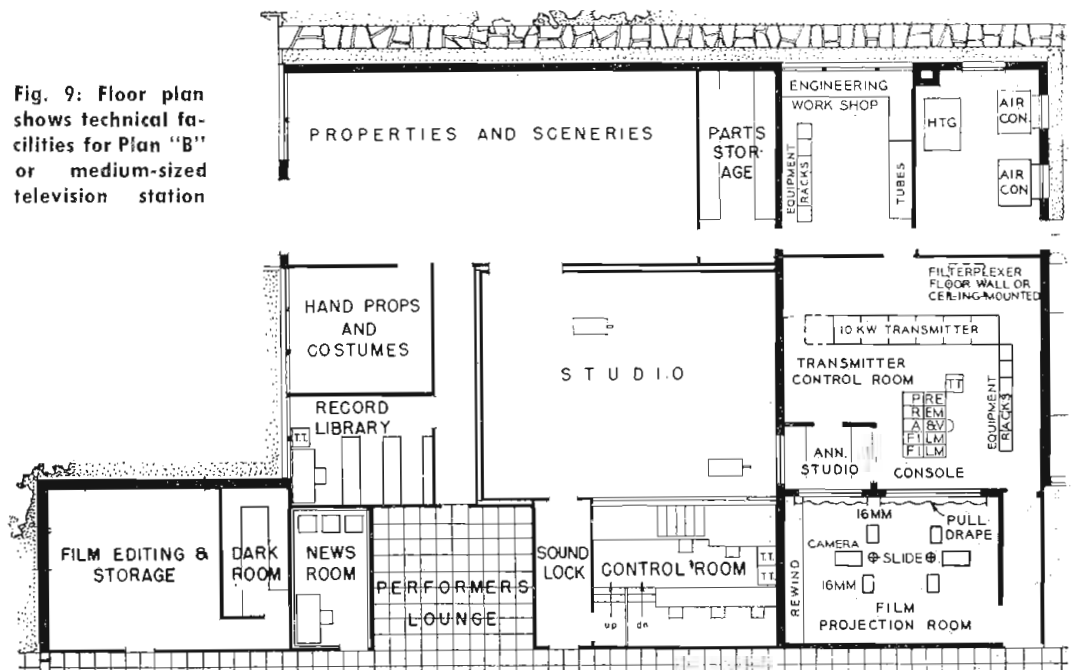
Floor plan shows technical facilities for Plan "B" or medium-sized television station
